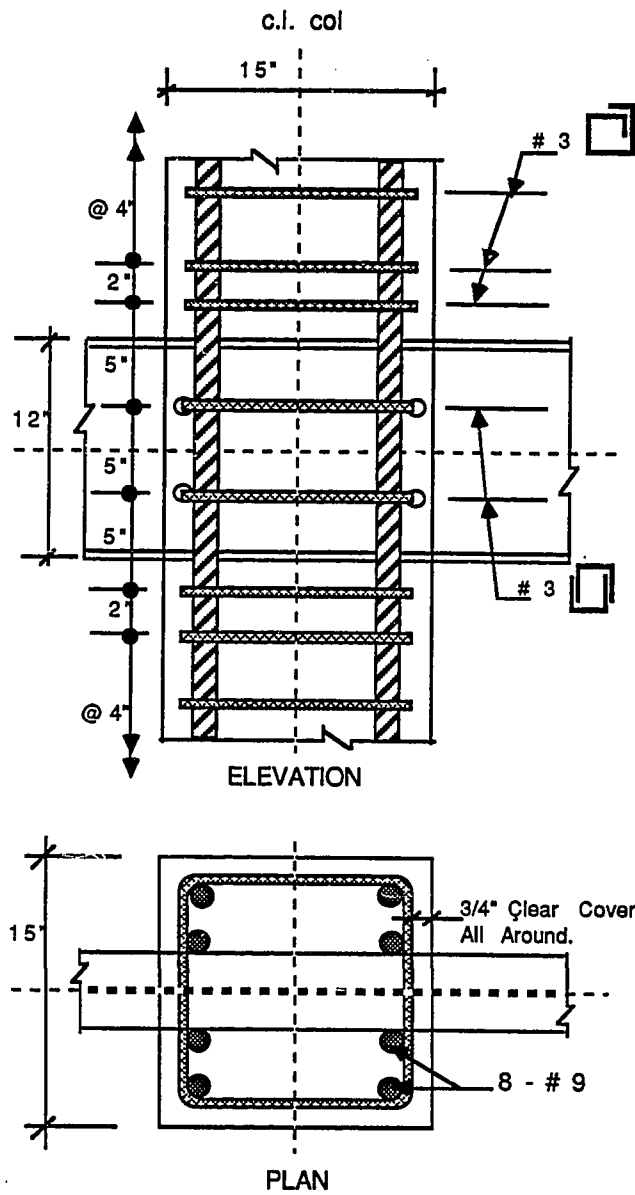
(a) Joint reinforcement for specimens 1 and 2.
